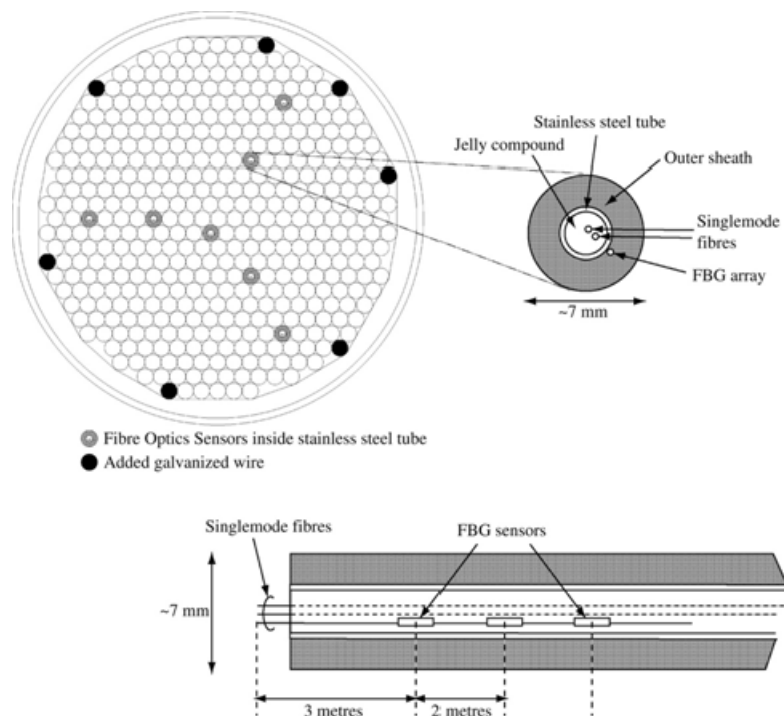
Fiber optic sensors embedded inside a bridge cable cross-section.
